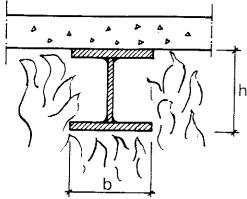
c. Floor construction where the flames penetrate between the girders
